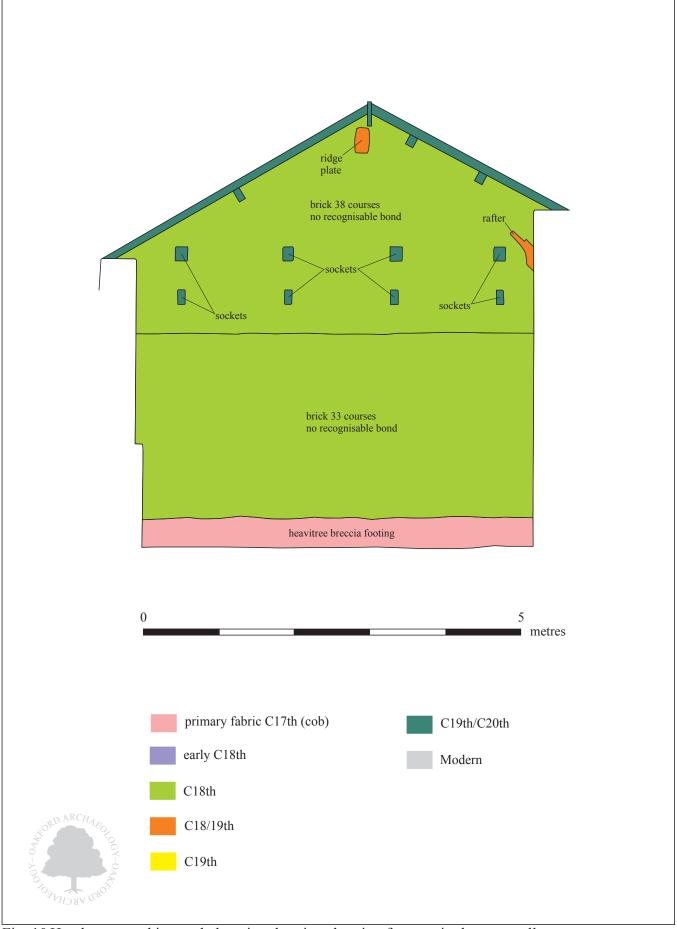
Hand-measured internal elevation drawing showing features in the east wall.
